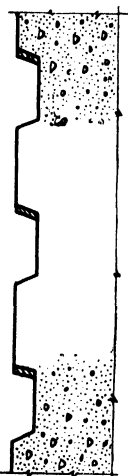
Possum Kingdom Dam. Section through haunch and deck.
